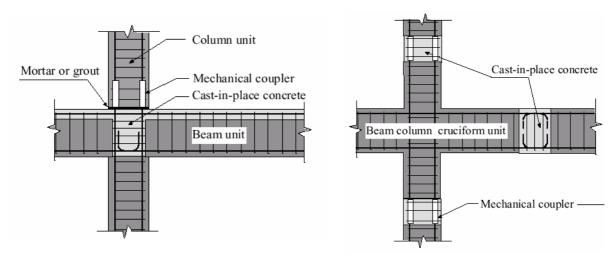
Typical arrangements of precast units and cast-in-place concrete [after Watanabe (2000)]
